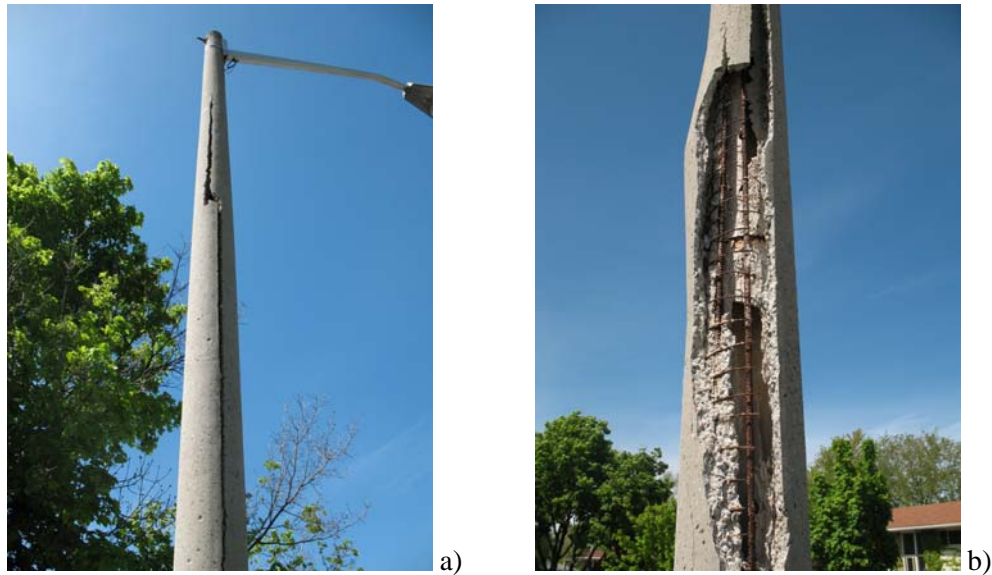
a) and b): Longitudinal cracking, corrosion and spalling caused by differential shrinkage and segregation of concrete mix
